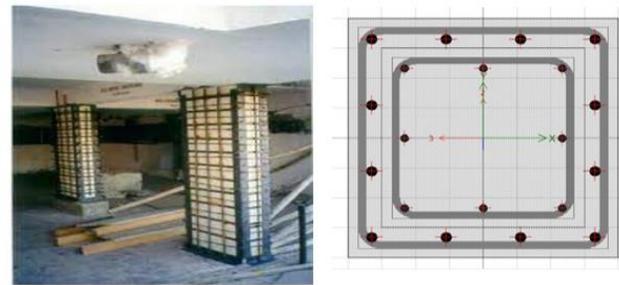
Jacketing of Column with Enhanced Column Section 400mmx400mm
